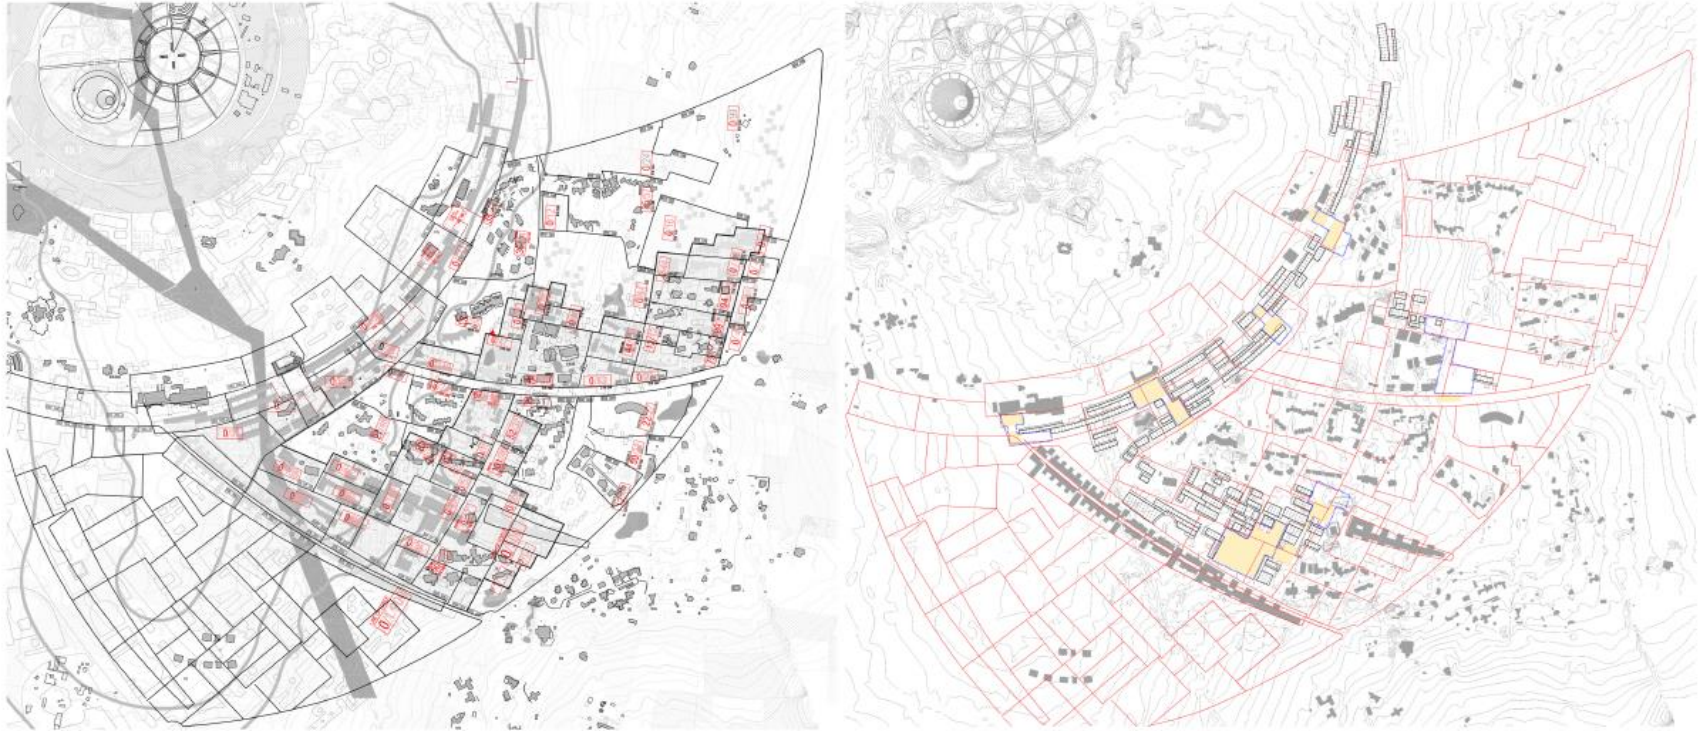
DETAILED DEVELOPMENT PLAN I RZ SECTOR 1&2
